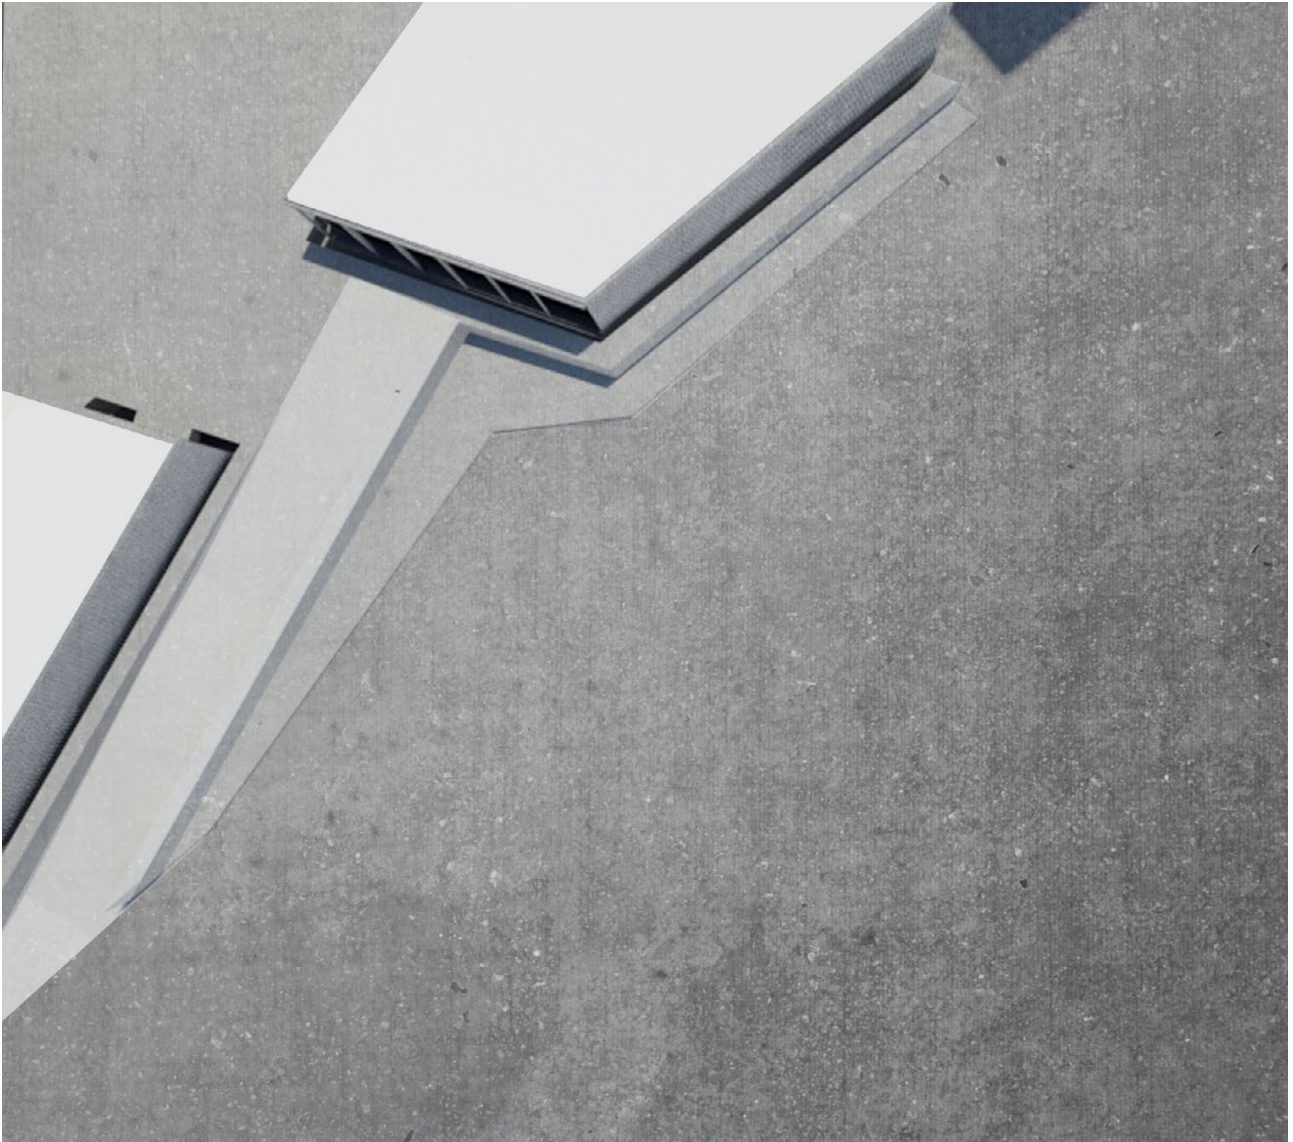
Mixed media image of cafe/shop and pop up gallery area, raised from existing pavement.
